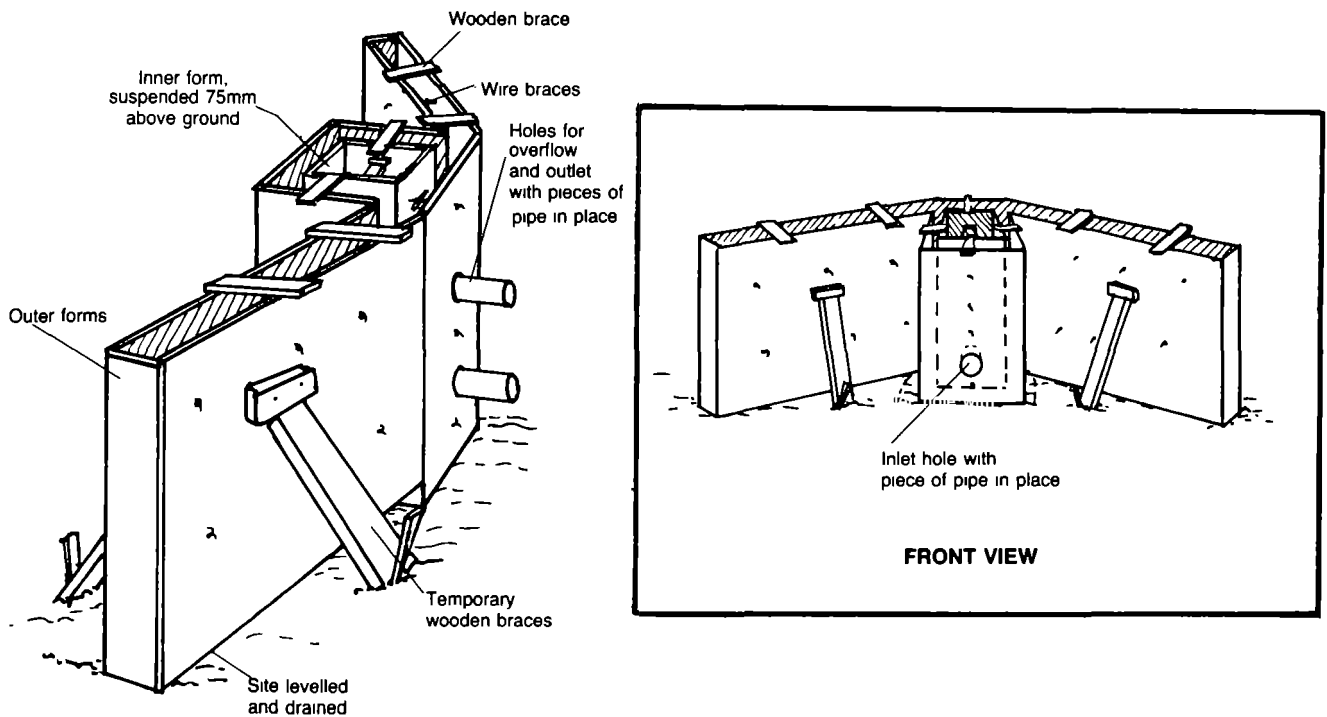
Forms for Anti-Seepage Wall and Collection Box
